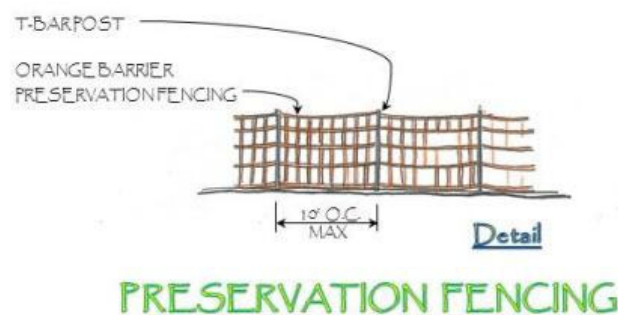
Detail of barrier fencing used to preserve existing vegetation.
